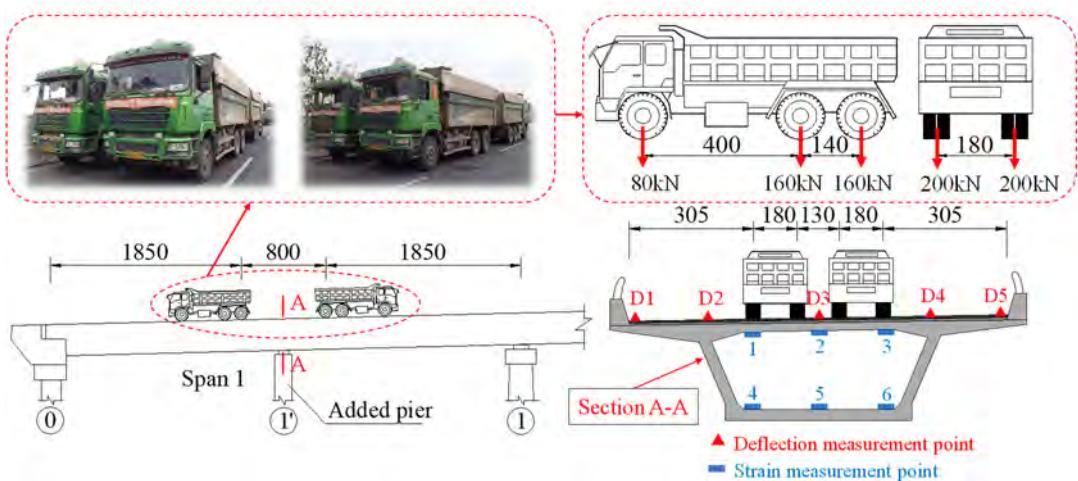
Loading test truck and measuring point arrangement (unit: cm).
